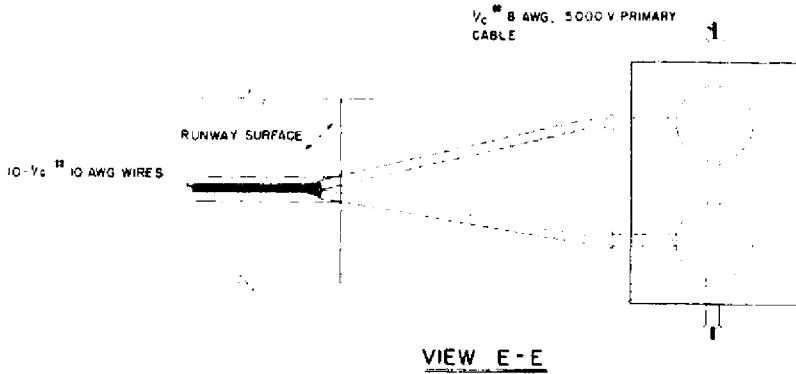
TYPICAL WIREWAY INSTALLATION DETAILS FOR TOUCHDOWN ZONE AND CENTERLINE LIGHTS
